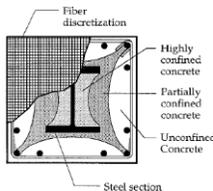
Fiber Idealization of Concrete Encased Composite Column
